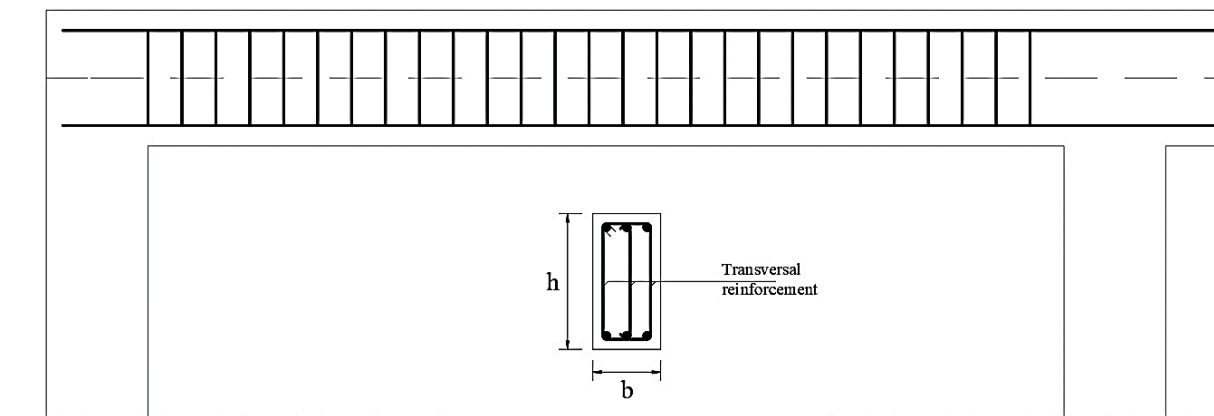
Longitudinal and transversal beam section with transversal reinforcement
